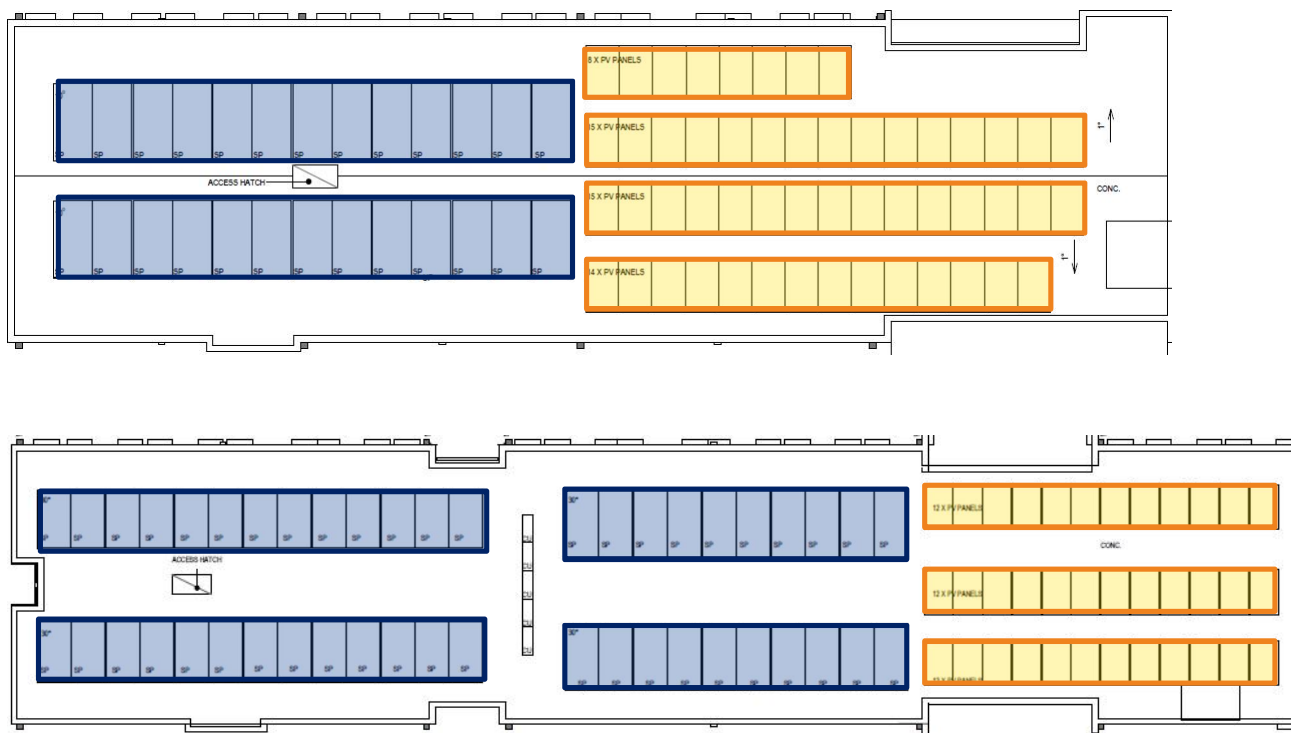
Roof plans of Buildings A & B (not to scale). Solar hot water panels are shaded blue, solar photovoltaic panels are shaded yellow.
